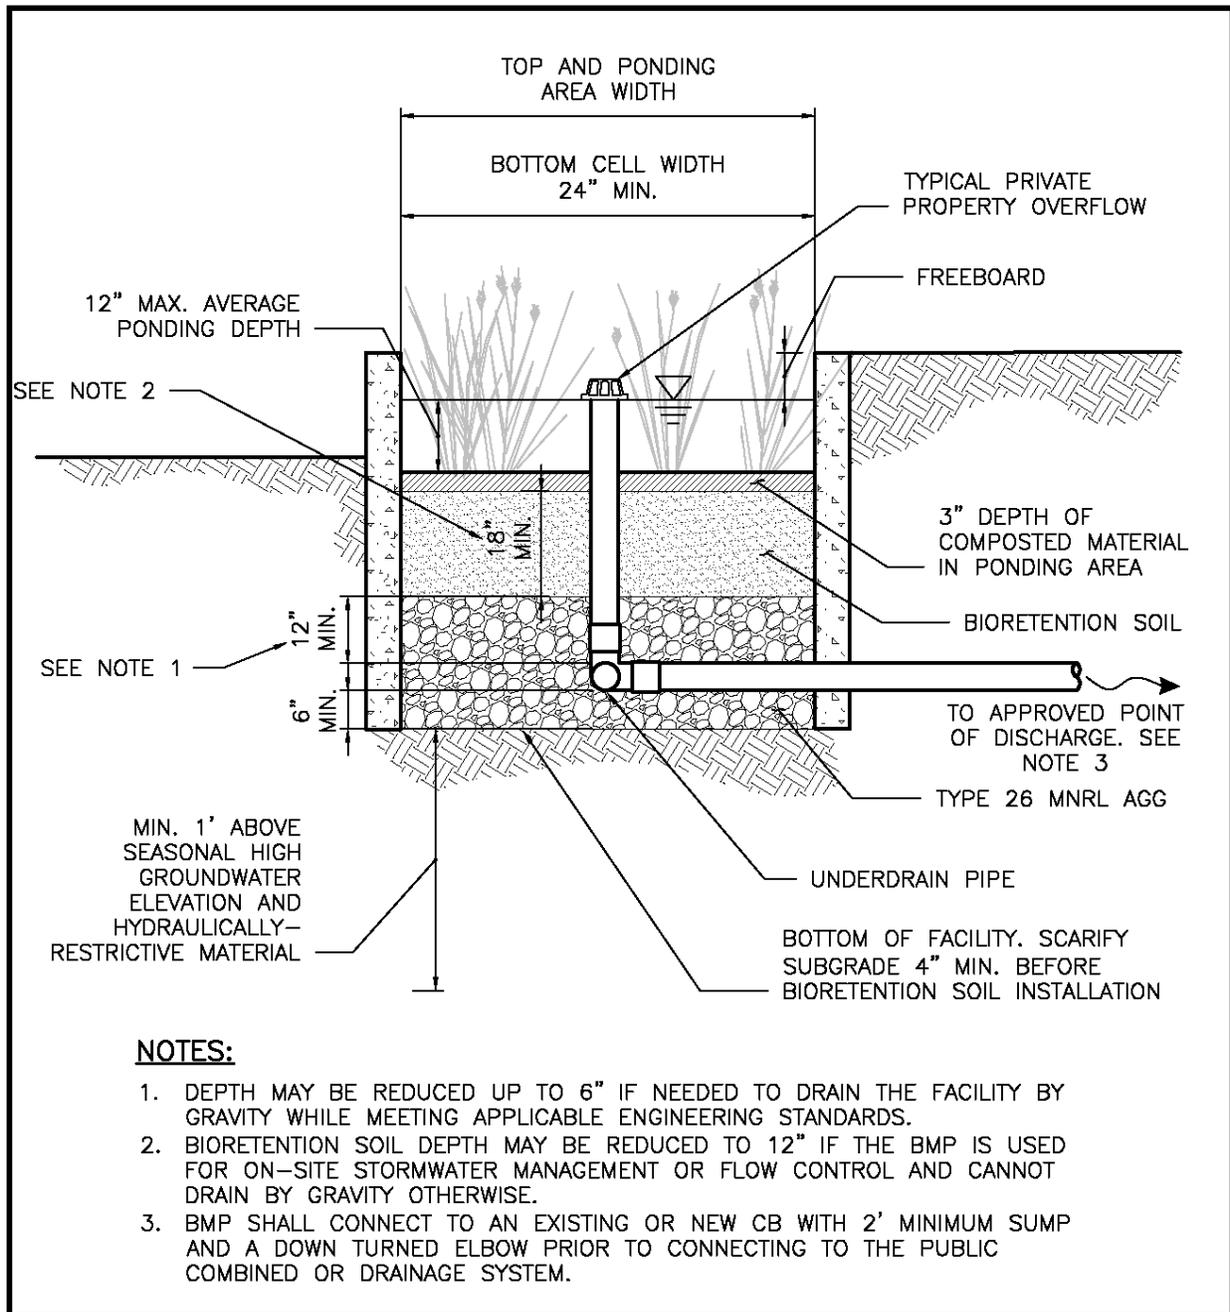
Infiltrating Bioretention Facility with Vertical Sides (with Underdrain).
